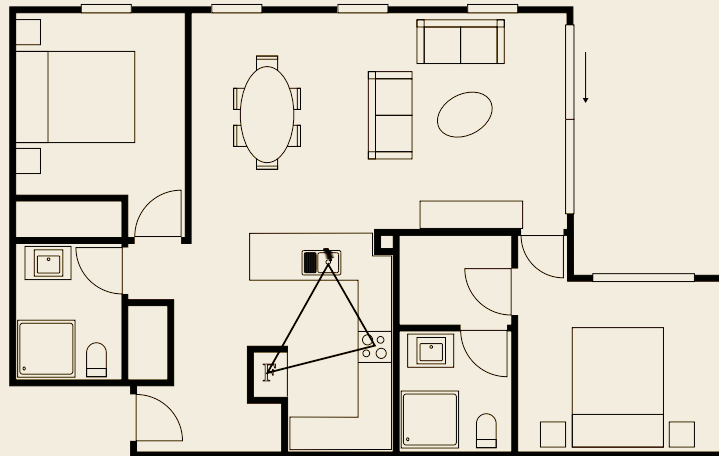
Original FABRIC Onehunga Apartments kitchen layout
